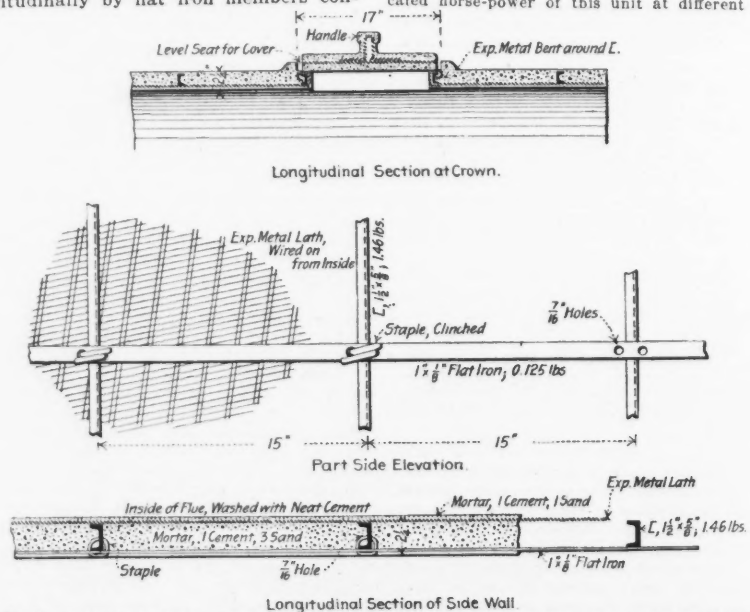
STRUCTURAL DETAILS OF CONCRETE AND STEEL SKELETON DUST FLUE.
